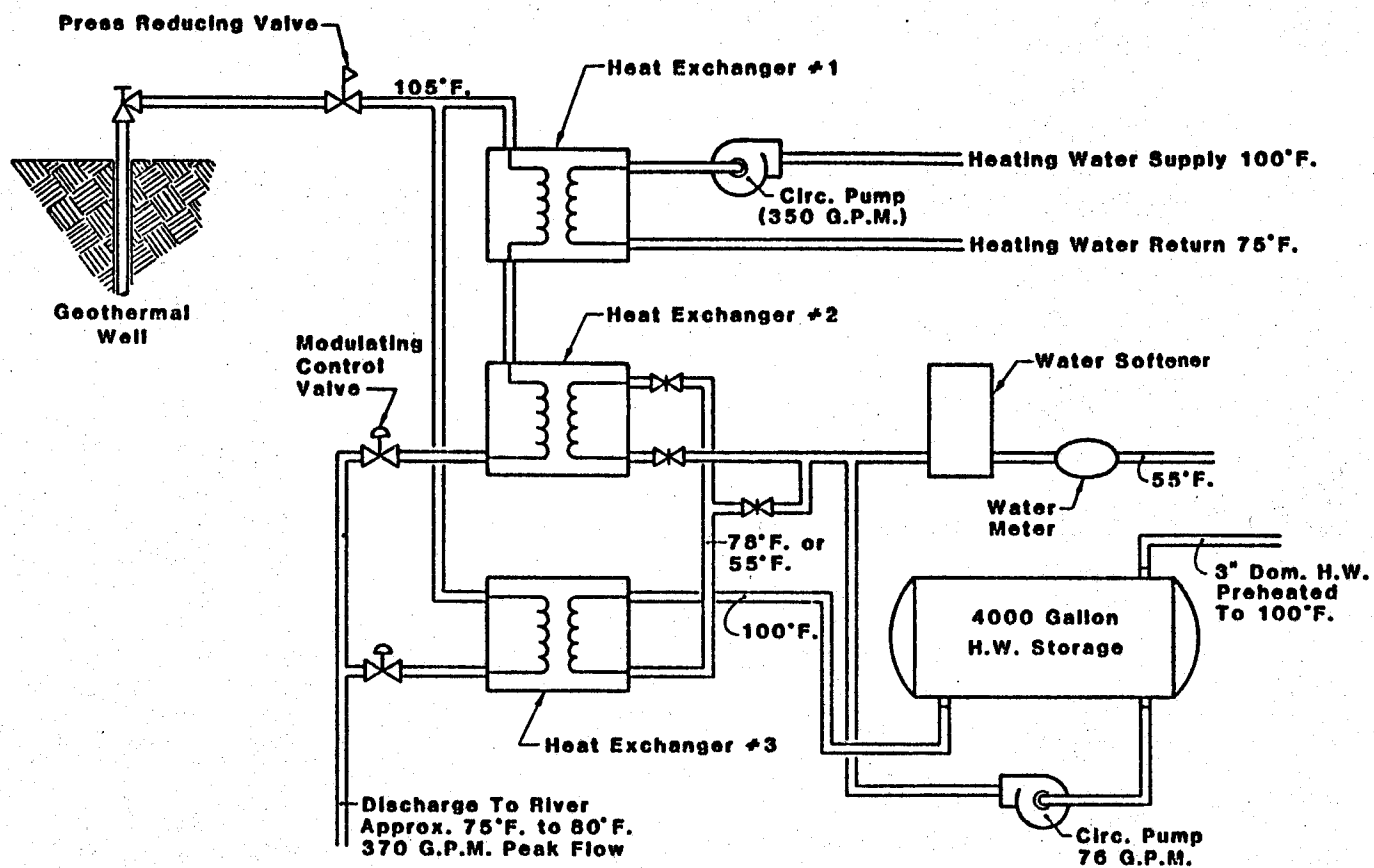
WELL HOUSE AND EXCHANGER BUILDING SCHEMATIC
